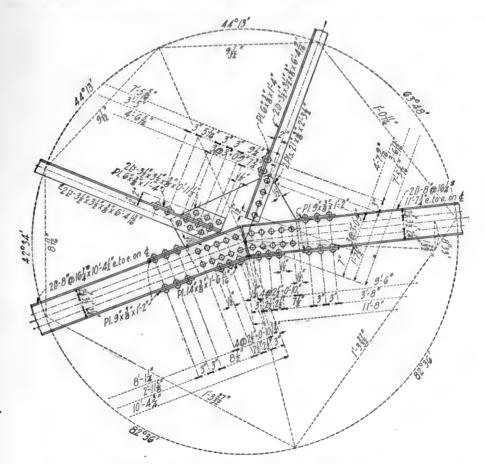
Joint of Roof Truss Completely Detailed. (Section of Shop Details of Roof Truss.)
